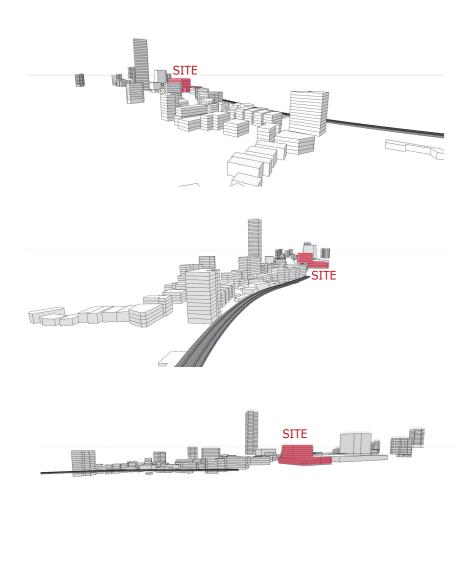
Birds-eye views and sections showing the existing profile along New South Head Road.
